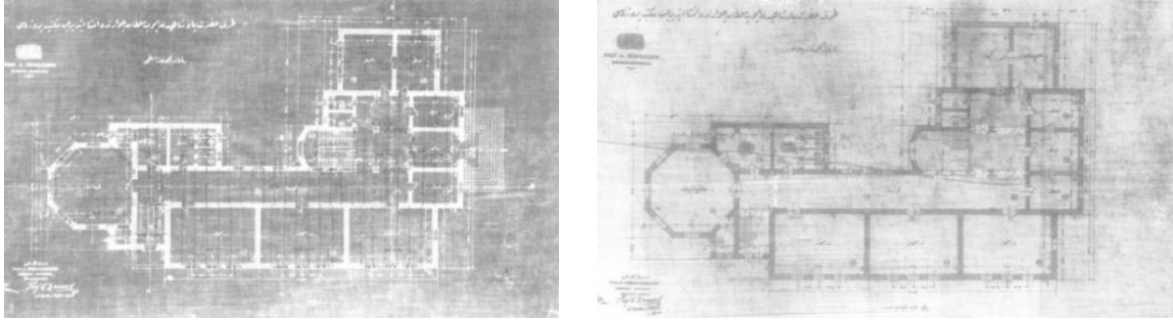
a) Reşadiye School Ground Floor Plan, b) Reşadiye School First Floor Plan [42]
